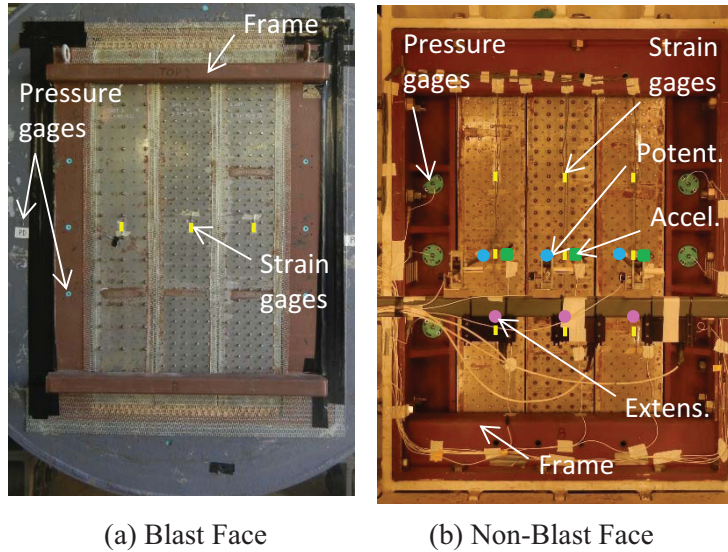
Specimen Setup in BLS (Pre-test Photos) With Sensor Layout
